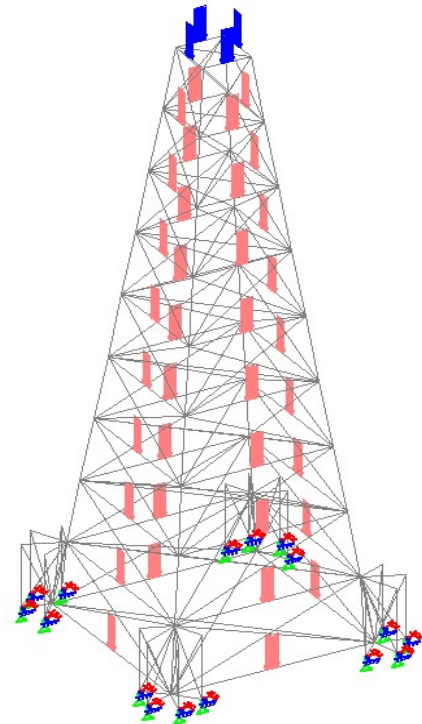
Typical application of conductor loads on horizontal beams of jacket structure
